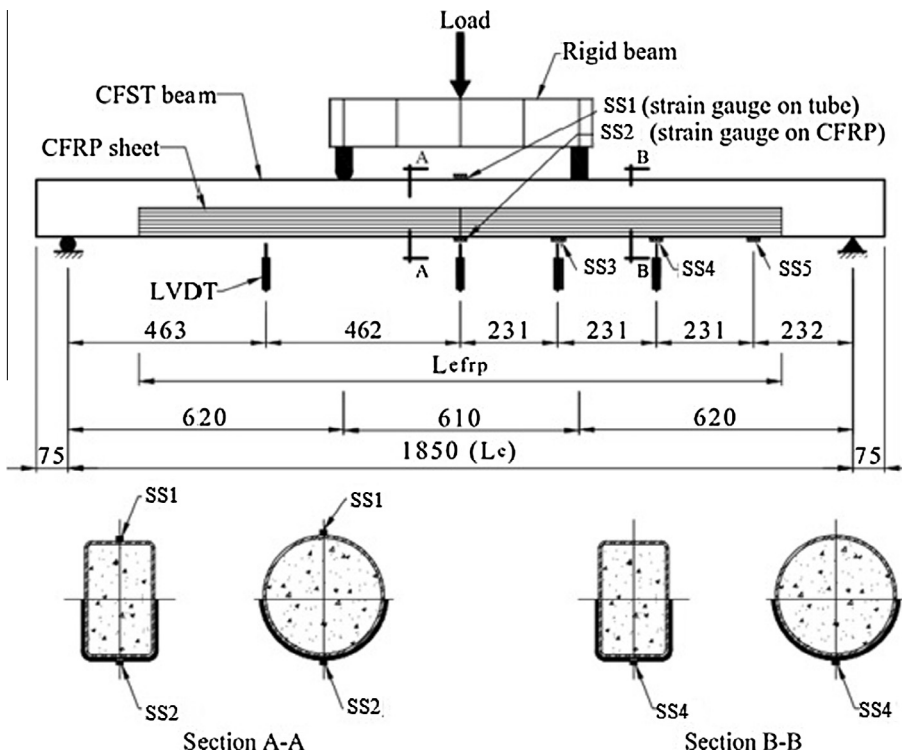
Test setup of CFST specimens strengthened with CFRP sheets.
